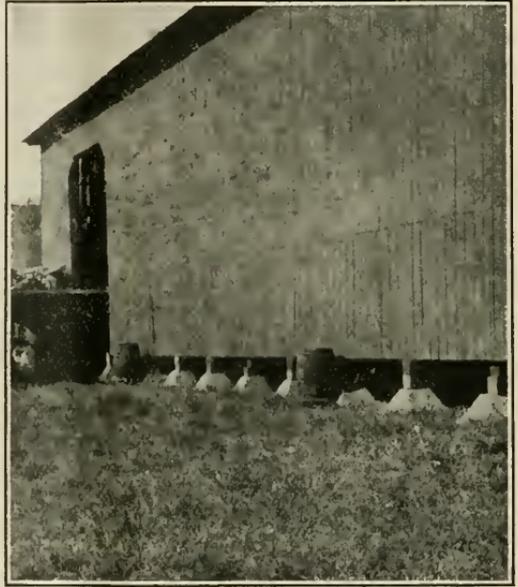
Large storage shed at Laurel, Miss., set on concrete piers, high off the ground, with ample ventilation from all sides. This is the best type of construction.
